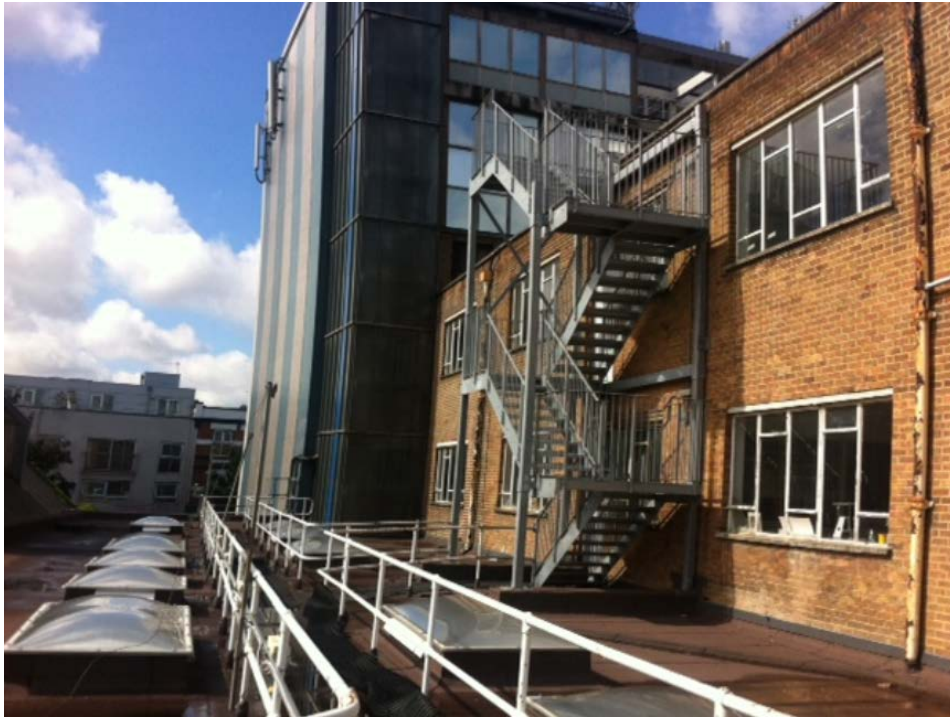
Proposition of AHU 1 and 2 situated at first floor level on either side of existing external stairs.
